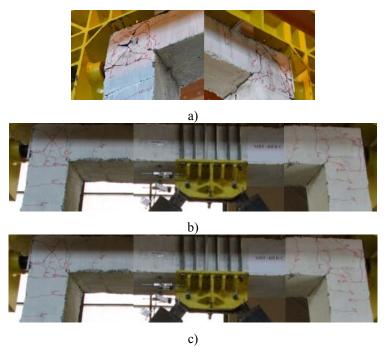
Cracks in the concrete elements after the test: a) initial RC frame; b) frame strengthened with BRB; c) strengthened with CBS
